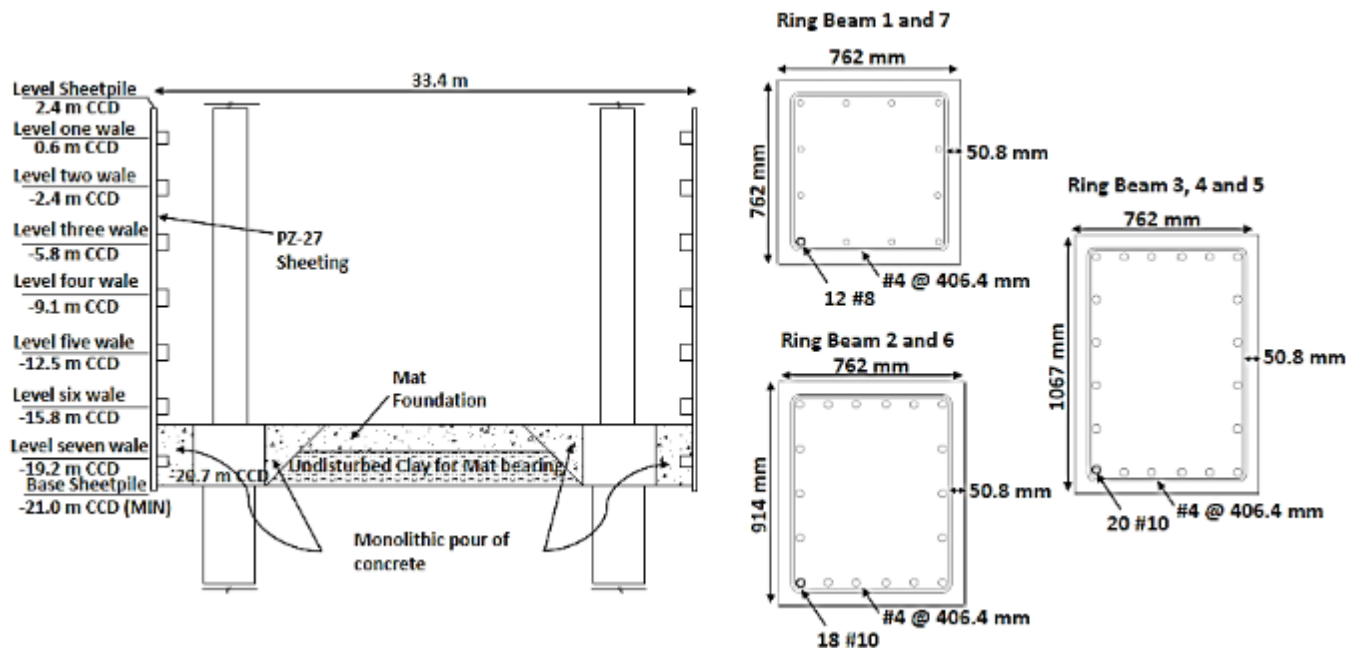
Cofferdam cross-section and concrete ring beams structural details.
